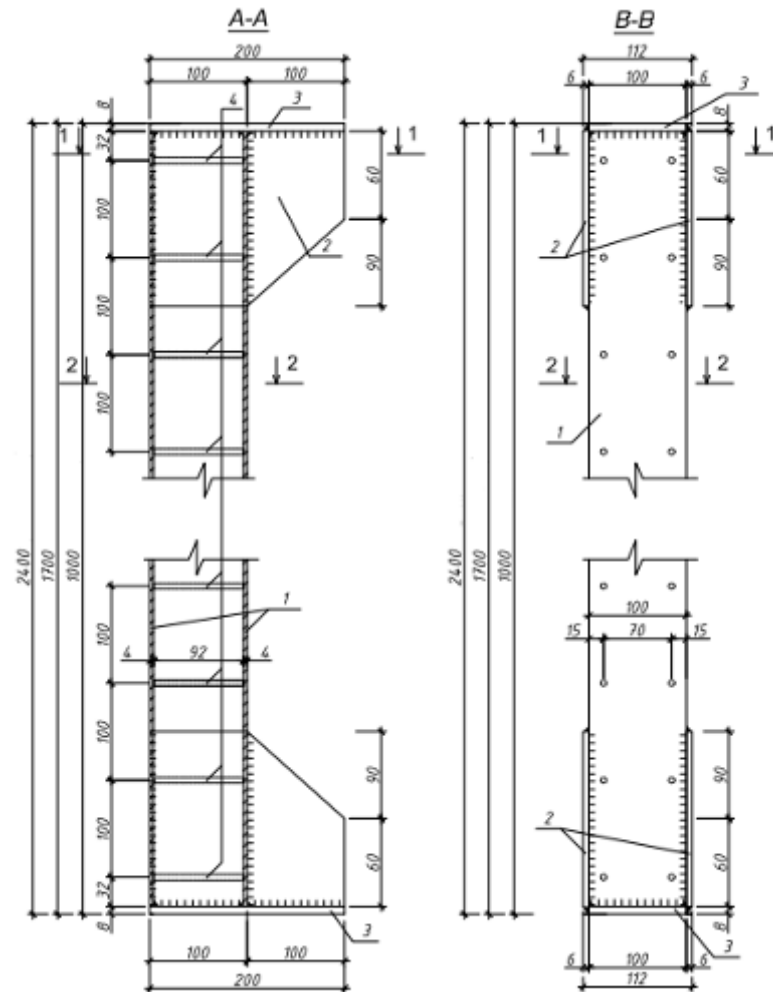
Designs of experimental samples with reinforcing sheets perpendicular to the bending moment:
